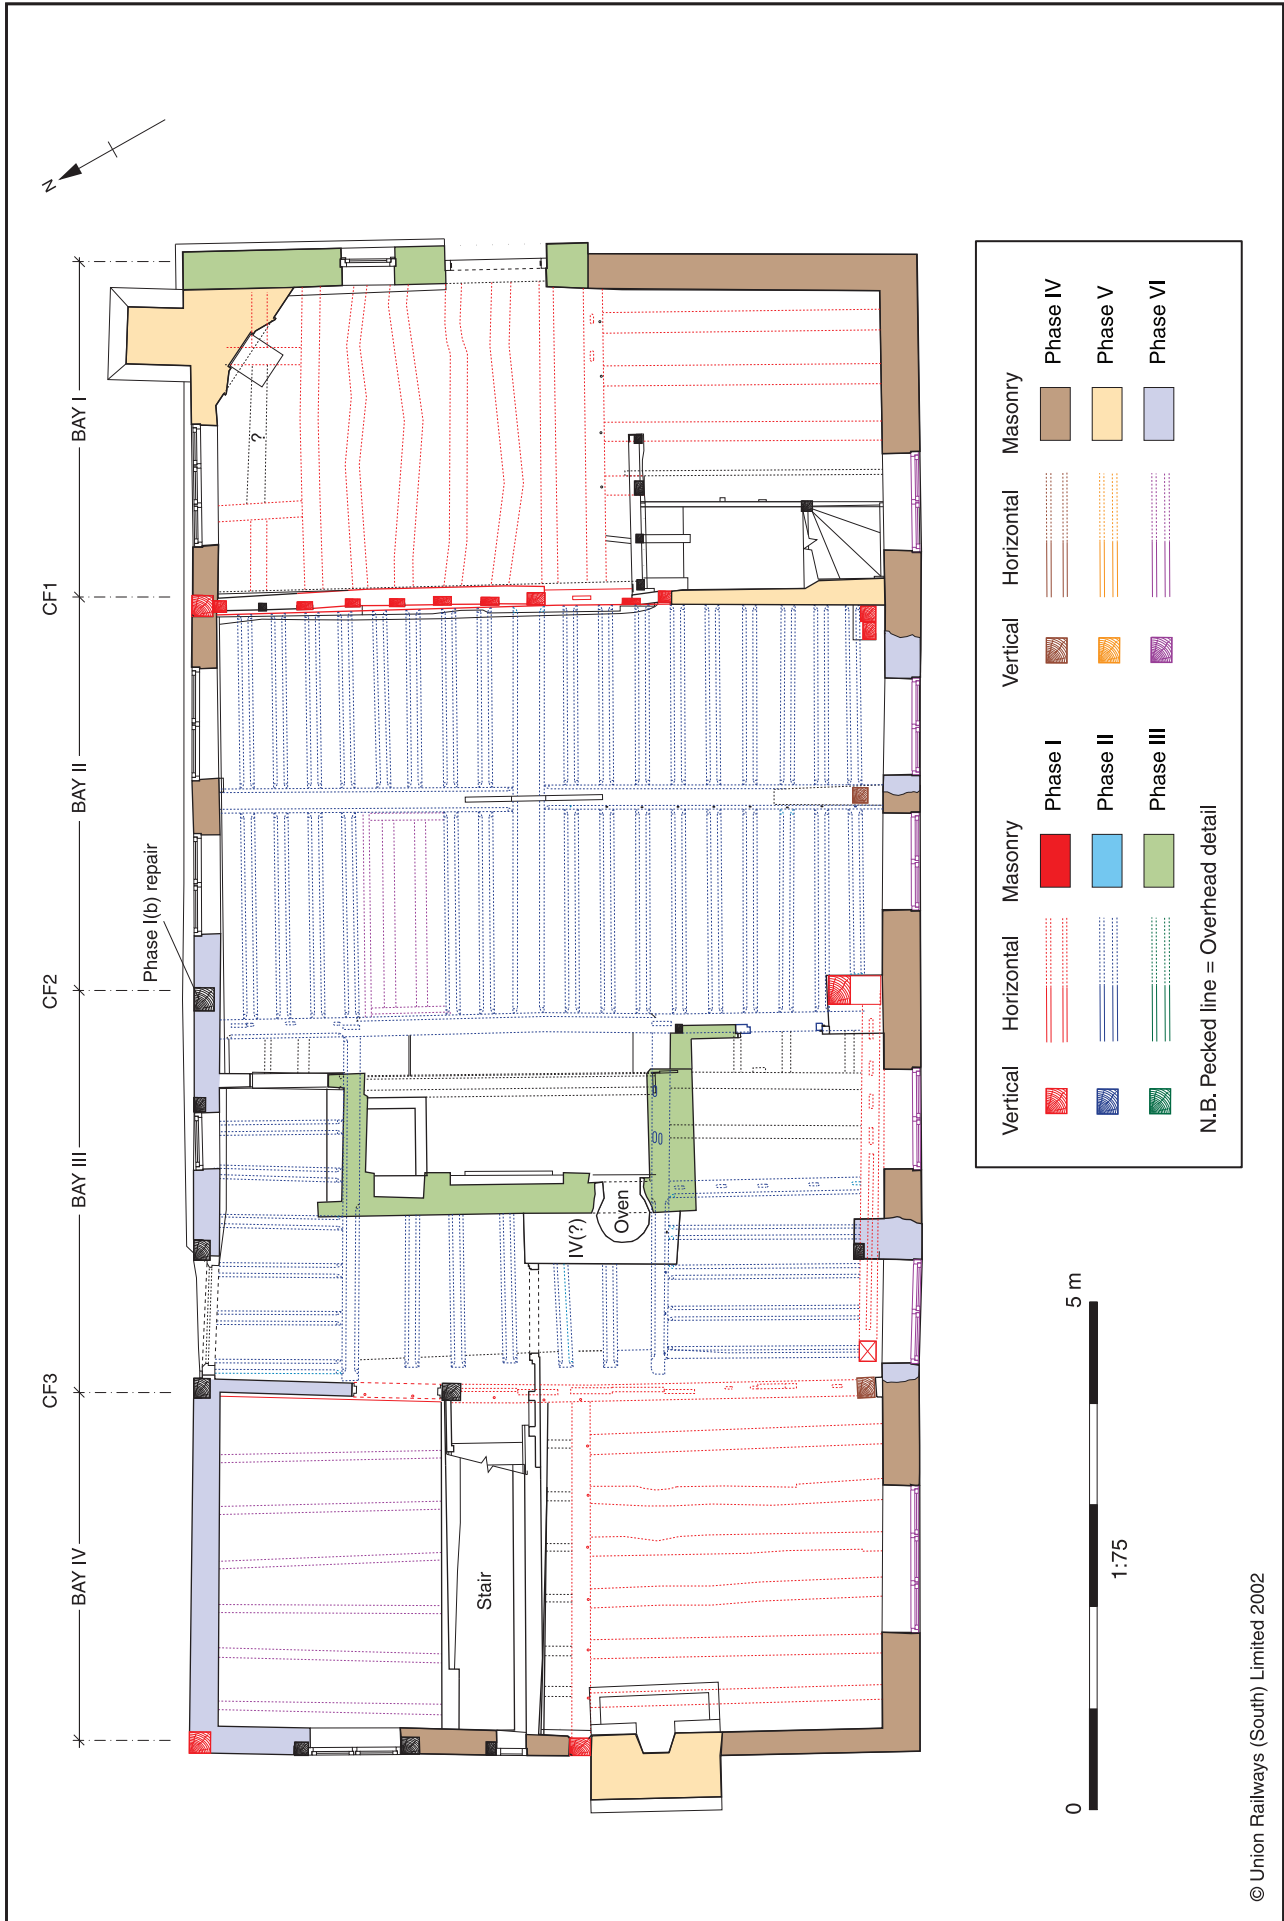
Talbot House: ground-floor plan with phasing of principal structural elements
